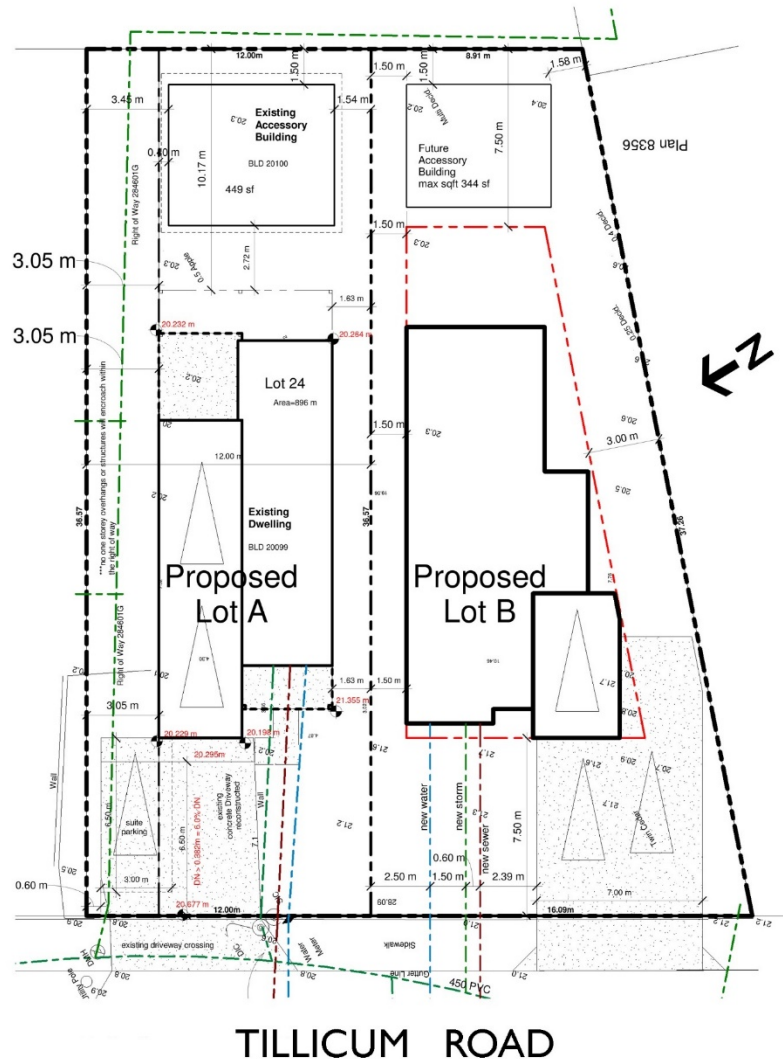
Proposed Subdivision (from plans by McNeil Building Designs Limited)
